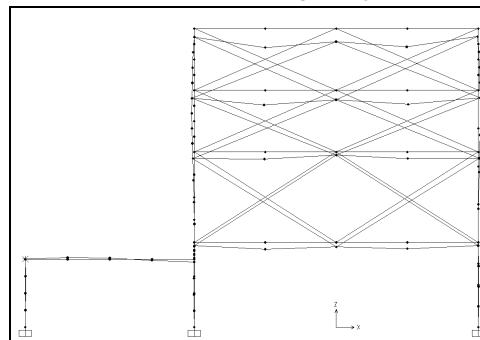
Retrofitting alternative 3 - braced frame 1
